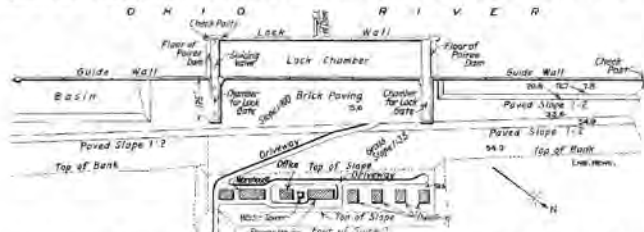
PLAN OF LOCK AT OHIO RIVER DAM NO. 37. (SHOWING THE GUIDE WALLS AND THE BASIN FOR REPAIRING BARGES, ETC.).
